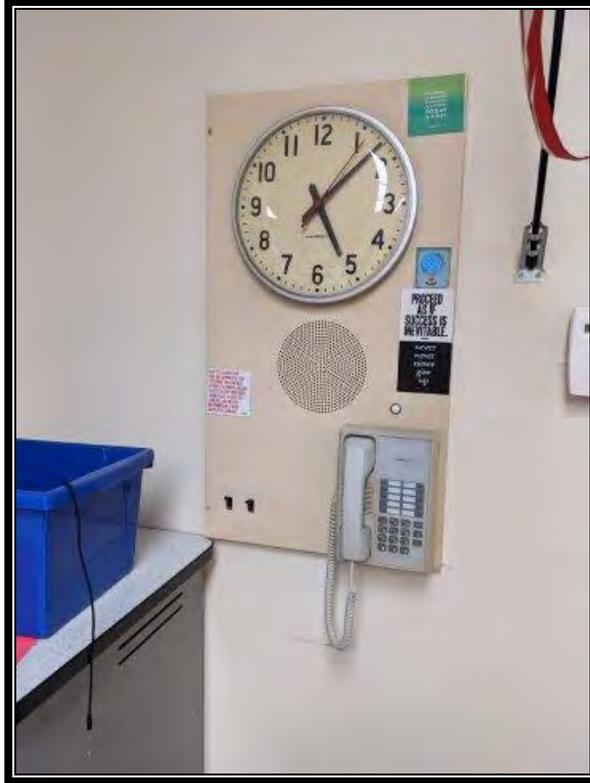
Non-ACM Gypsum Board (P.A. & Clock)
